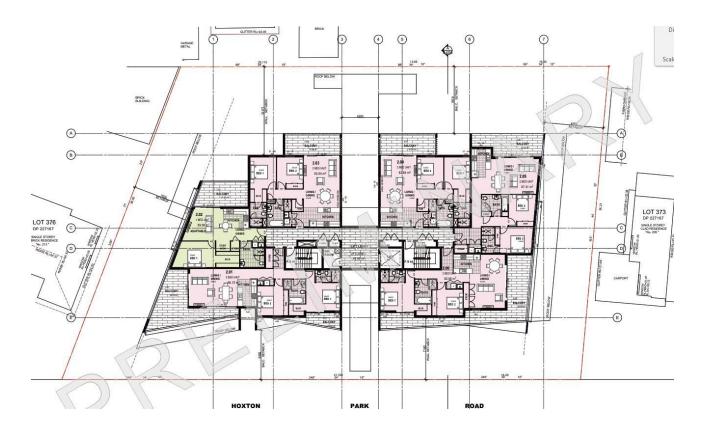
Floor Plans, Levels 1-3 and Level 4
